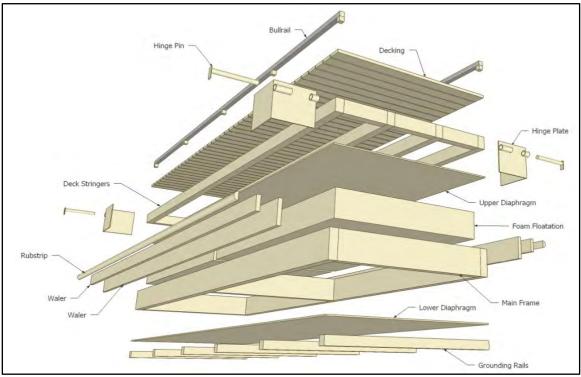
Exploded view of standard Marine Board wood boarding float design
